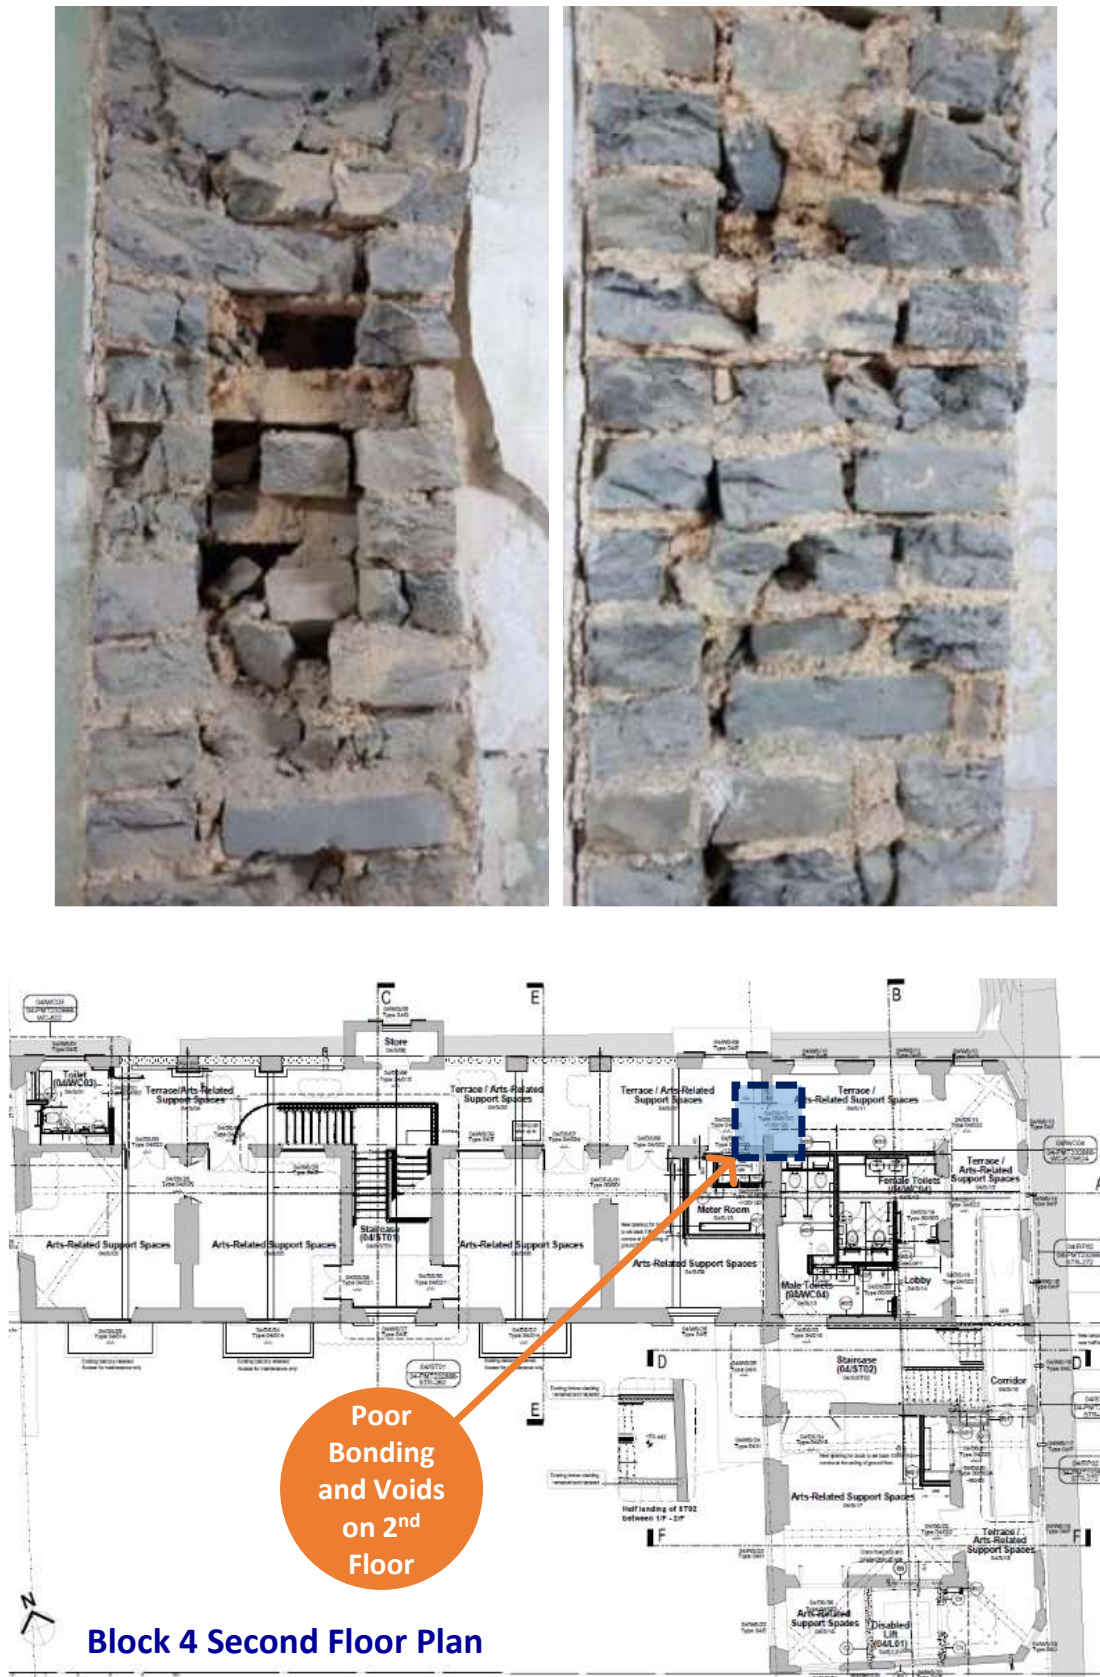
Views of brickwork showing poor bonding and voids in the centre of the walls whilst cutting new door openings;
